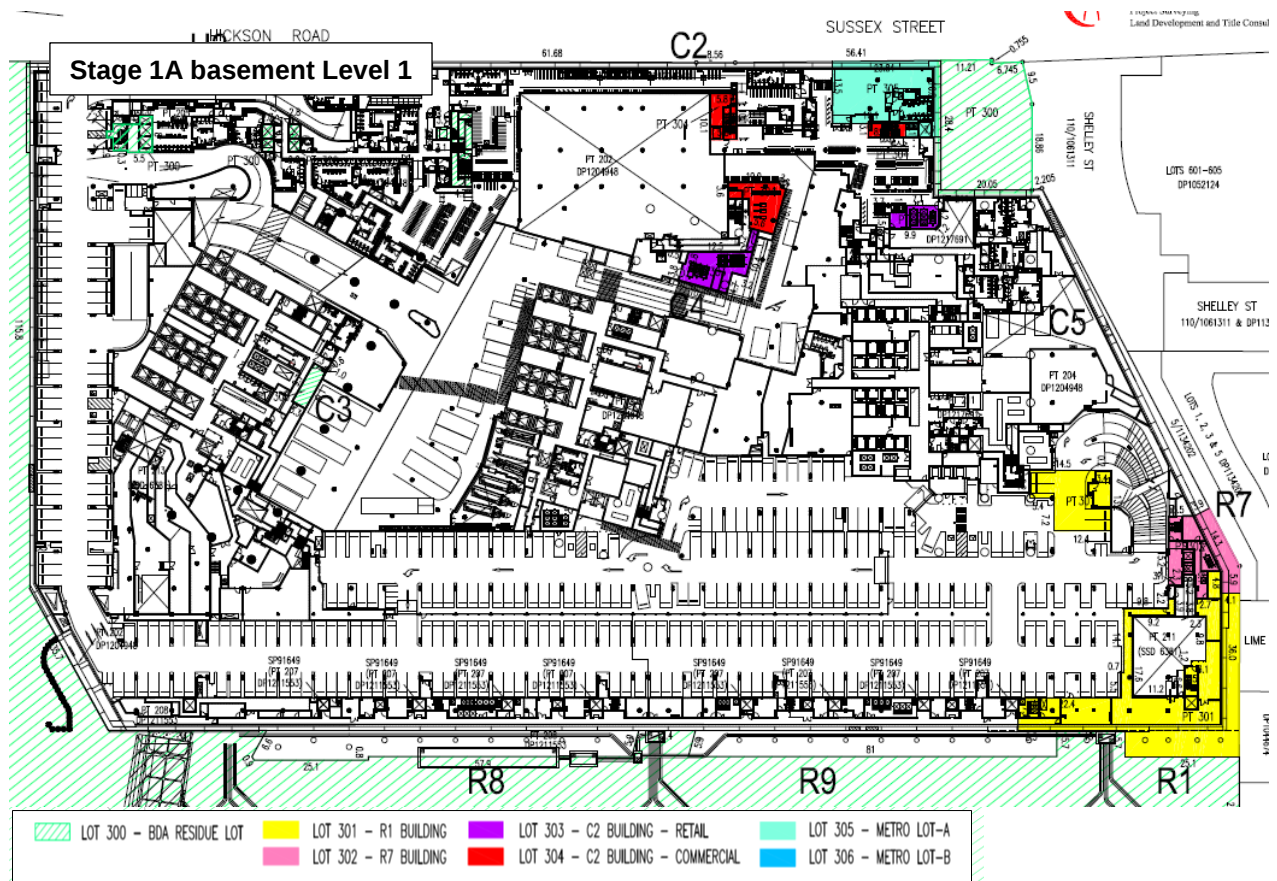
Proposed plan of subdivision for Stage 1A basement Level 1 at Barangaroo South (Source: RtS)
